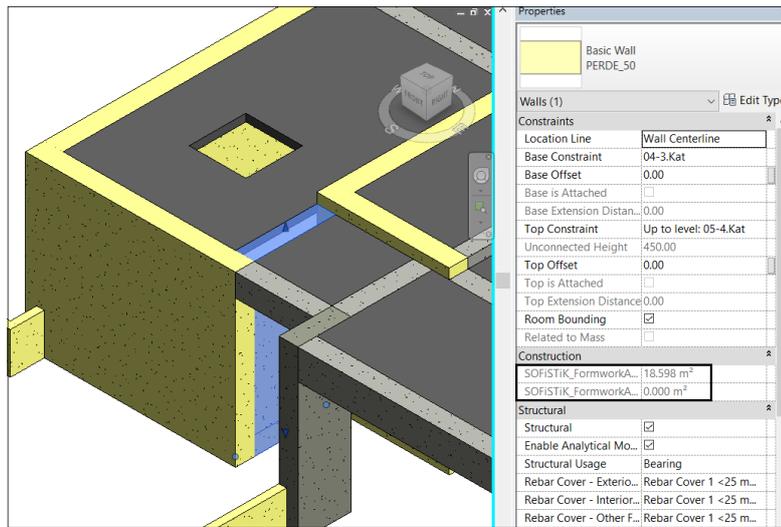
Corrected Formwork Area of Structural Wall in Revit Model
